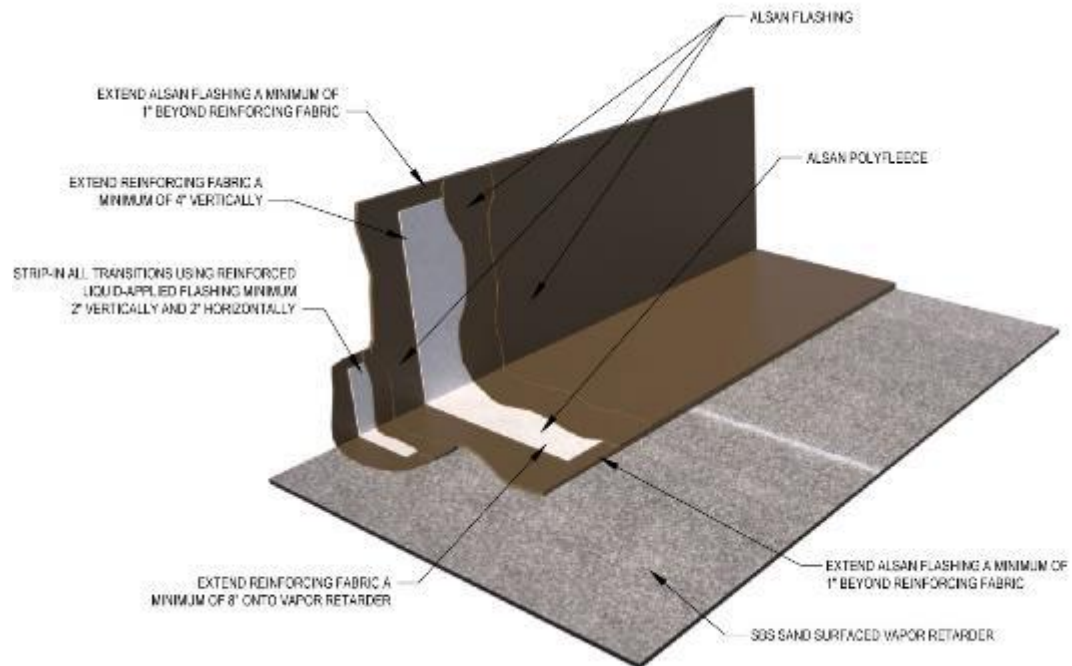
ALSAN® FLASHING Wall/Curb Flashing on Vapor Retarder
